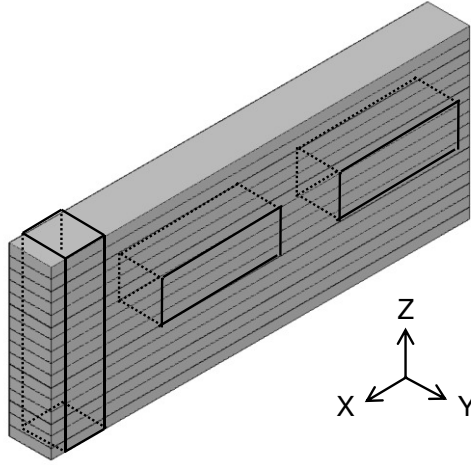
Extracting prismatic samples from the printed wall element to test the flexural strength.
